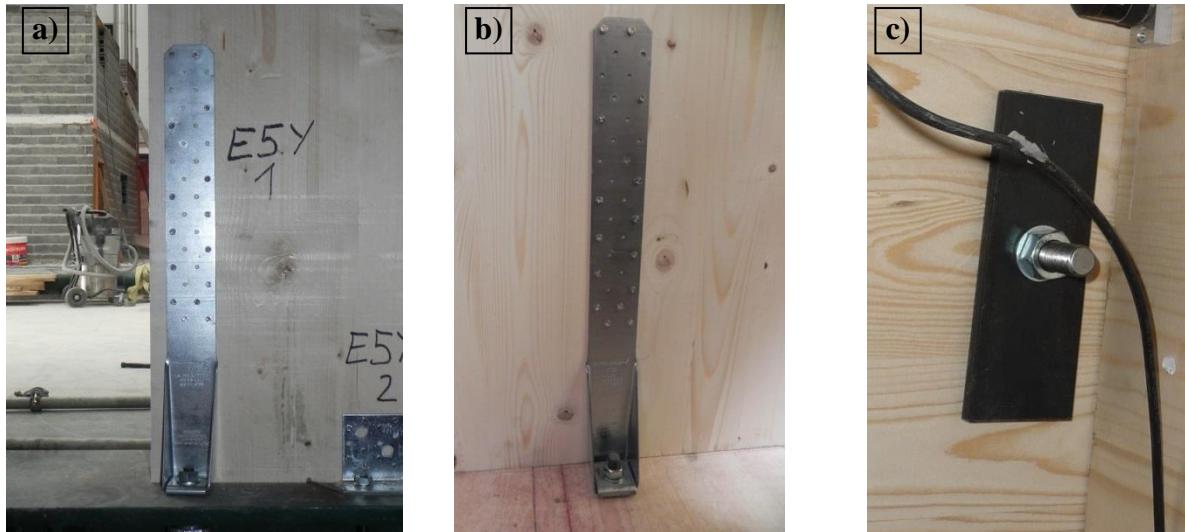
Hold-downs: a) CLT – steel frame; b) CLT – CLT; c) counter plate
